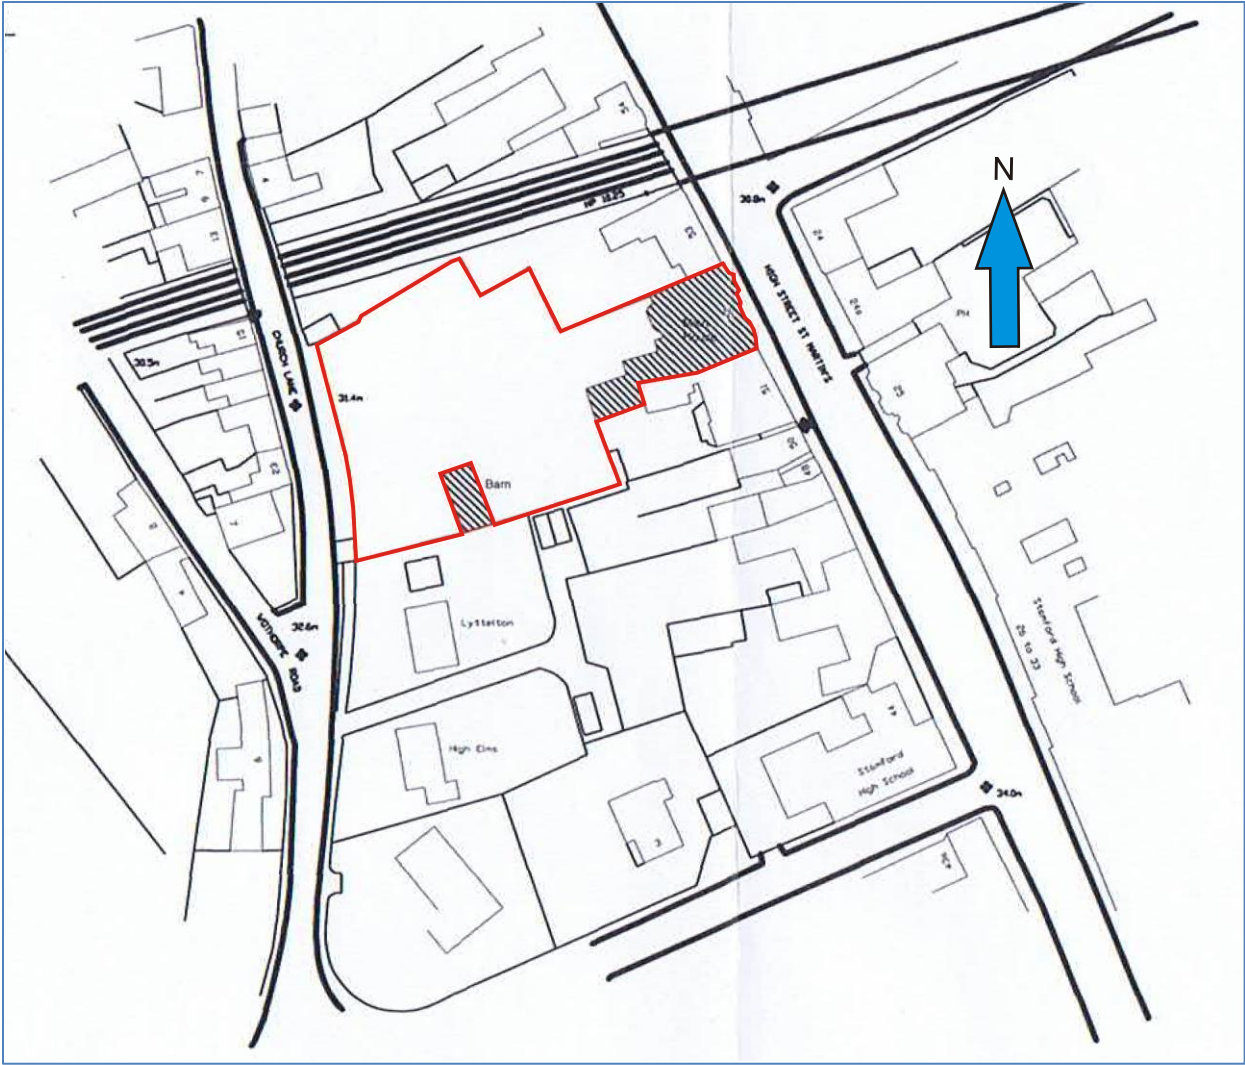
Site location at a scale of 1:2,500 showing the former site layout (extract from Architects plan).
